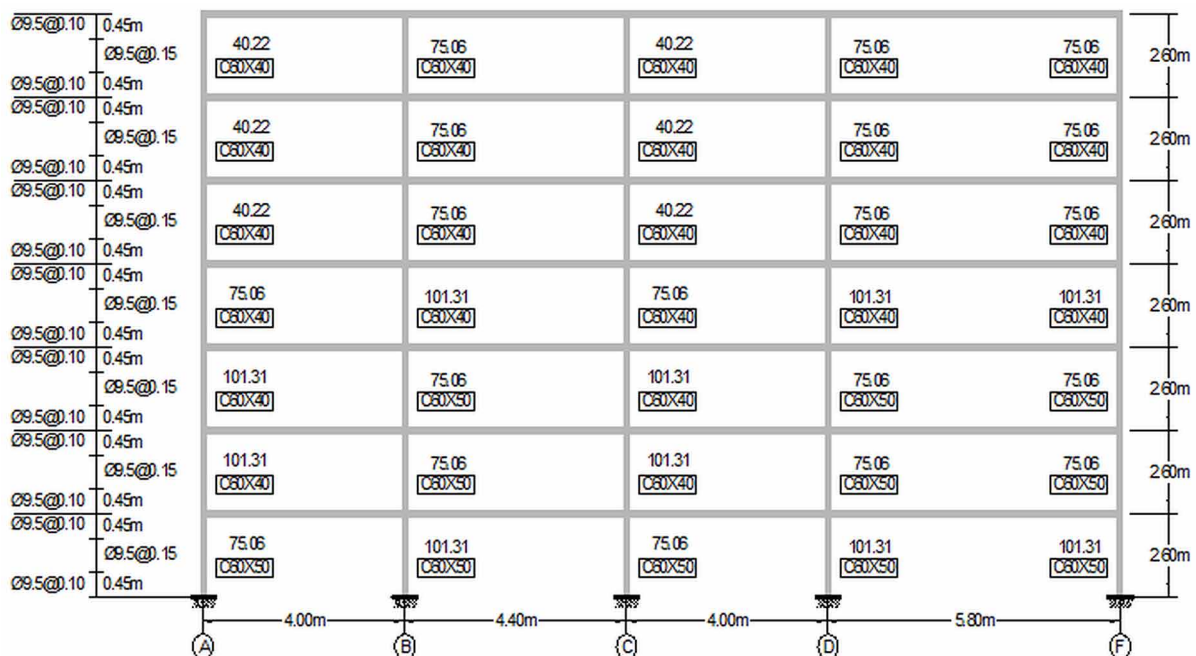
Residential building, geometry and reinforcement in columns of the frame 7
